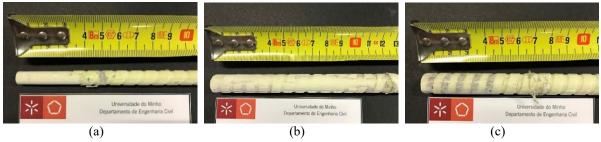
Failure modes: (a) TF - debonding failure + total failure of GFRP ribs; (b) PF - debonding failure + partial failure of GFRP ribs; (c) D - debonding failure.
